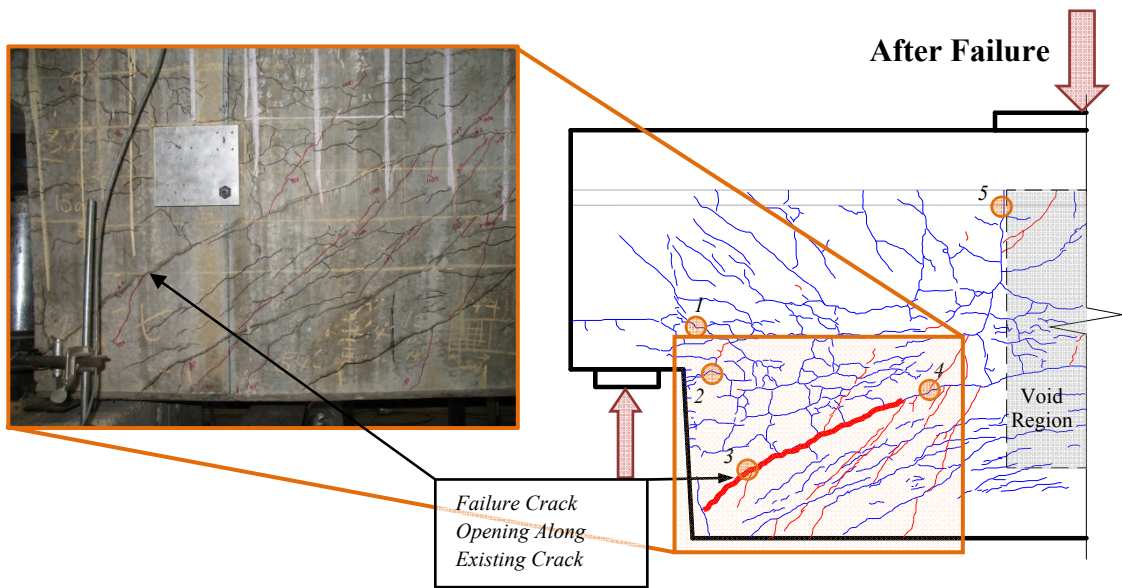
Cracking on the west side of beam RF-3R-9(a) after failure.
